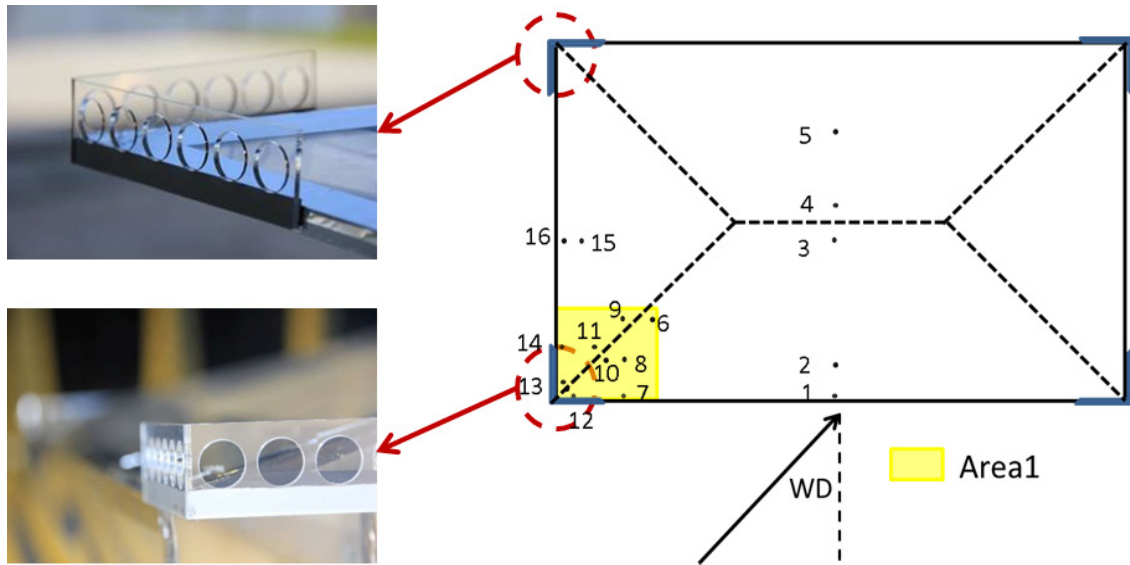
Discontinuous Perforated Parapets Installed on Hip Roof Building Model
